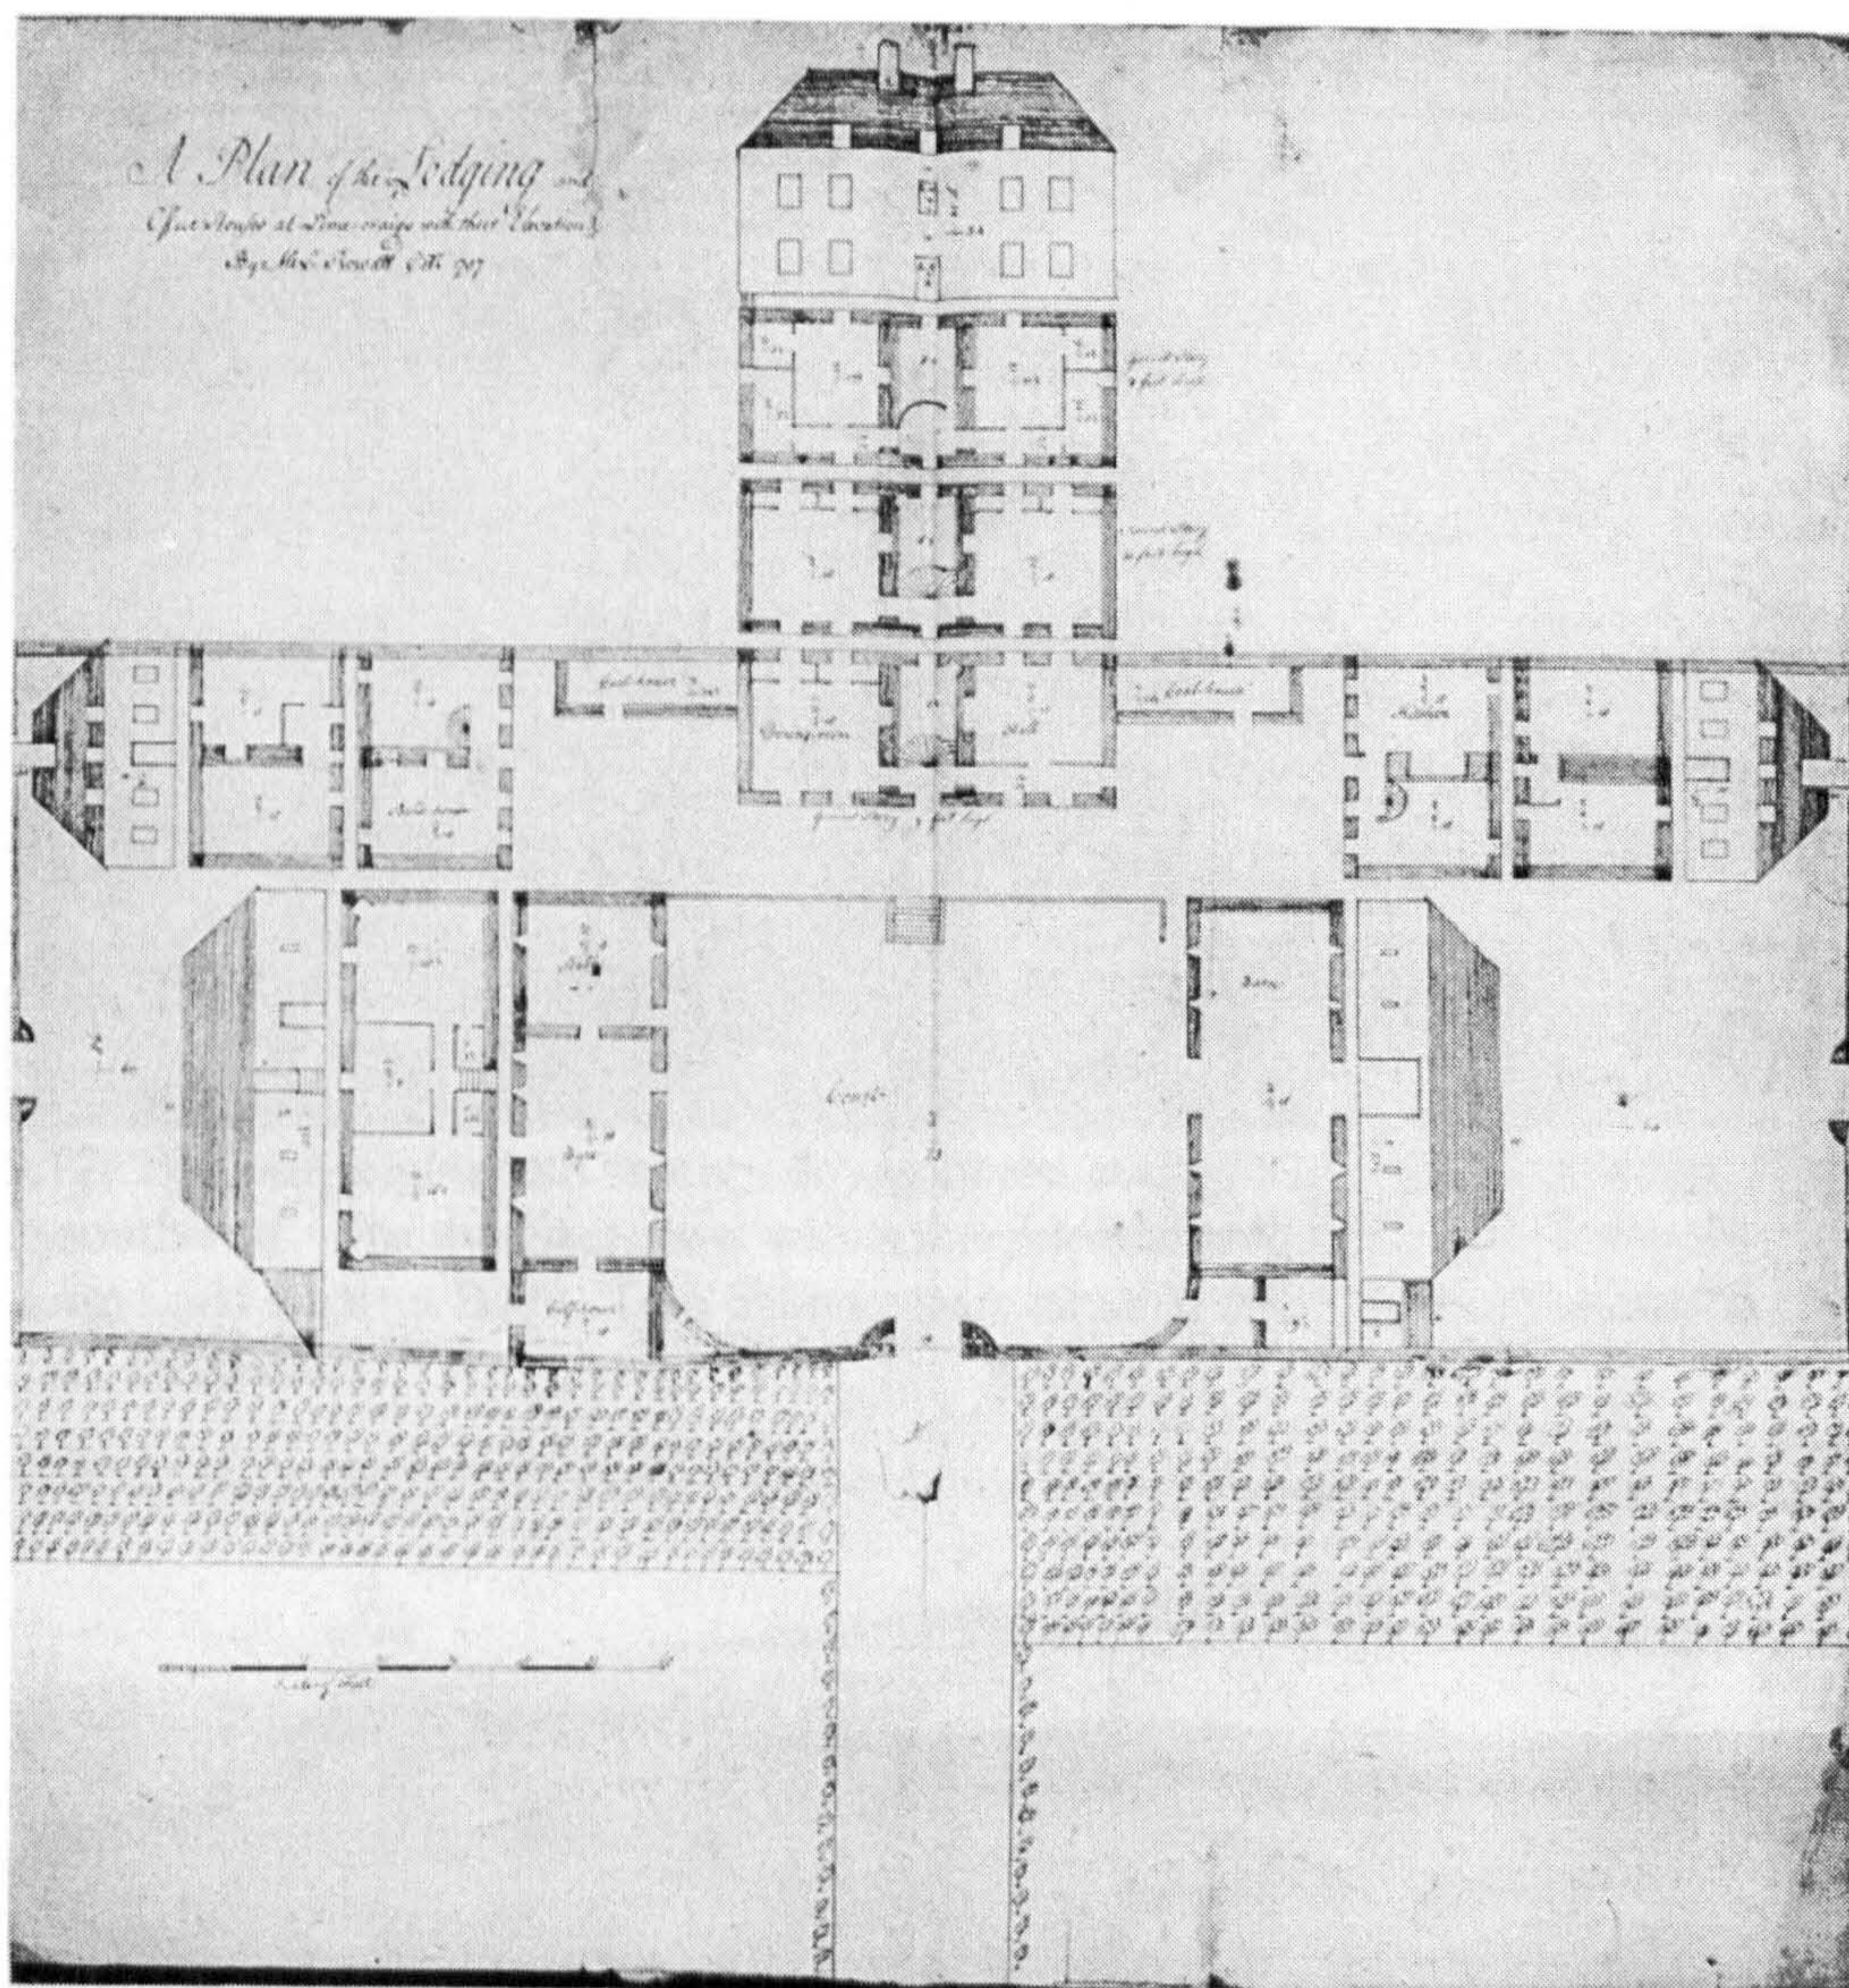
A 1757 plan of Limecraigs House, Kintyre (reproduced from RCAHMS 1971: plate 81a). The dwelling is surrounded by a courtyard of out-Buildings and it is highly subdivided.
